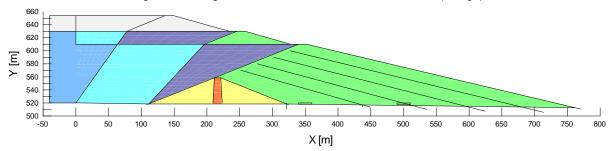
Construction of tailings dam to elevation 630 masl, (II stage, phase 1)
